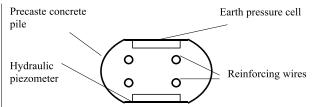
Instrumented cross-sections of a precast concrete pile (Gregersen et al.[8])
